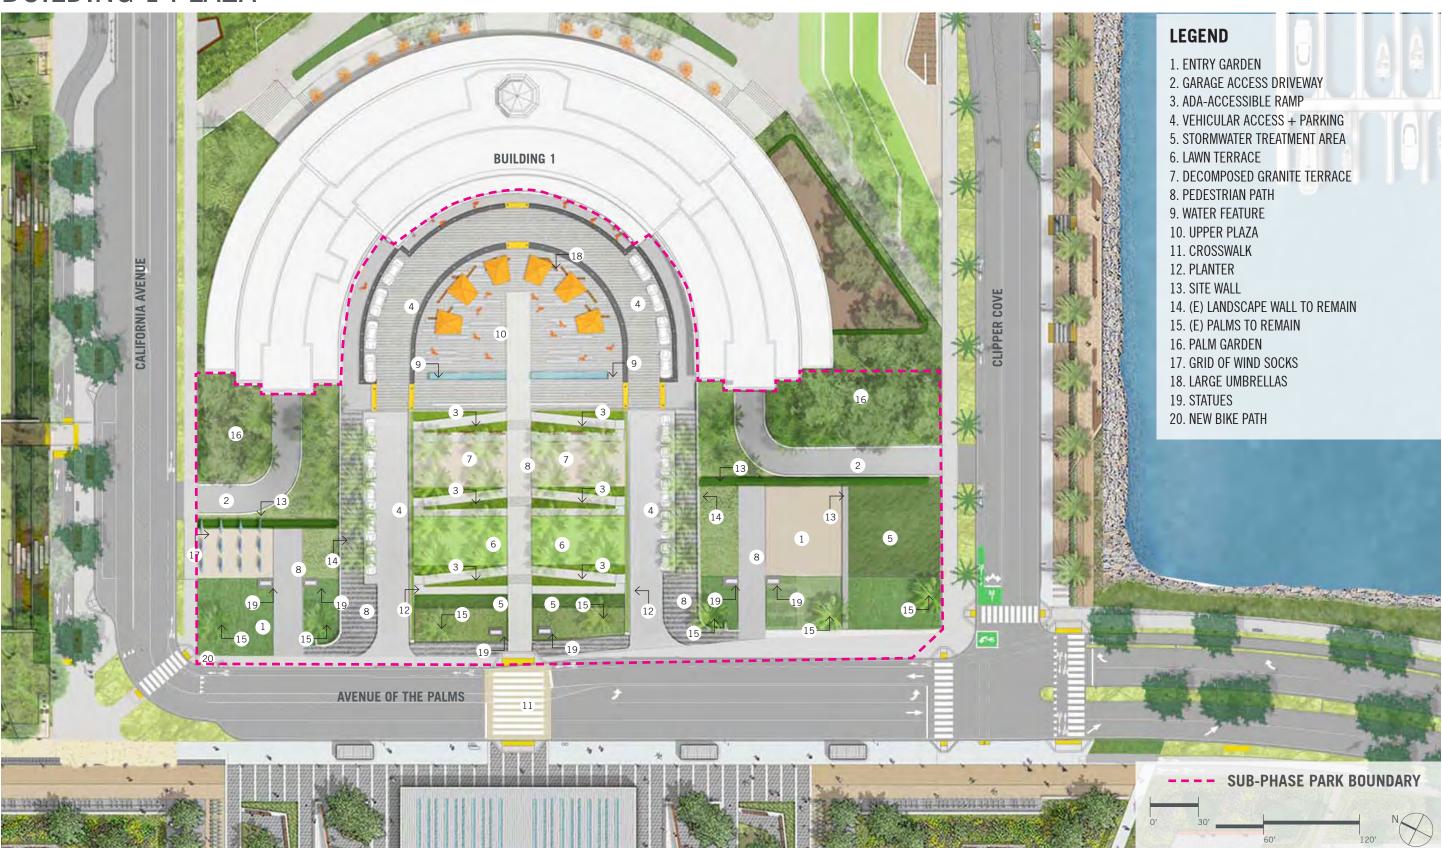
BUILDING 1 PLAZA ILLUSTRATIVE PLAN
